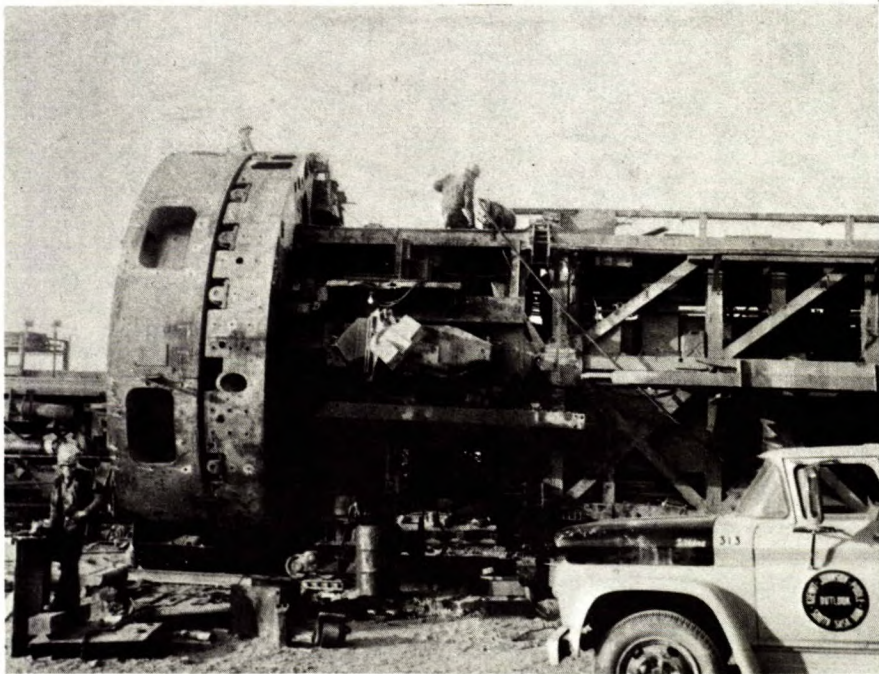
A side view of the mining machine (with wear ring and buckets removed from the cutterhead).
